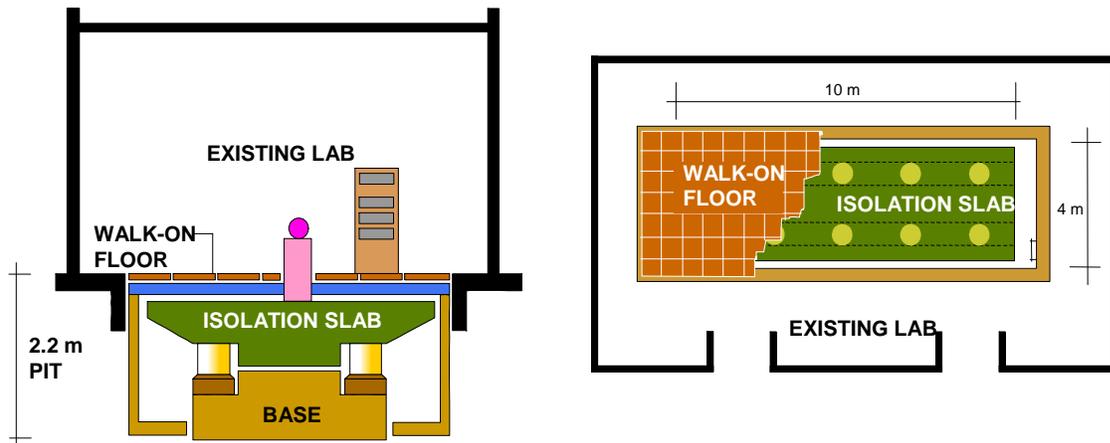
Conceptual section and plan views of NIST-A1 isolation system.¹
